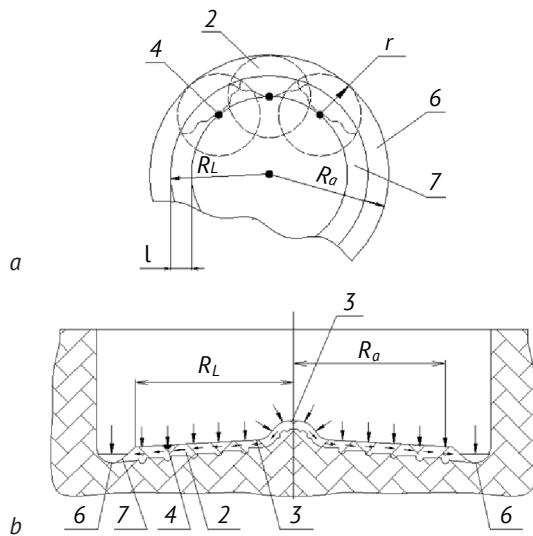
View of the face with a leading circumferential groove in the corner zone of the well
